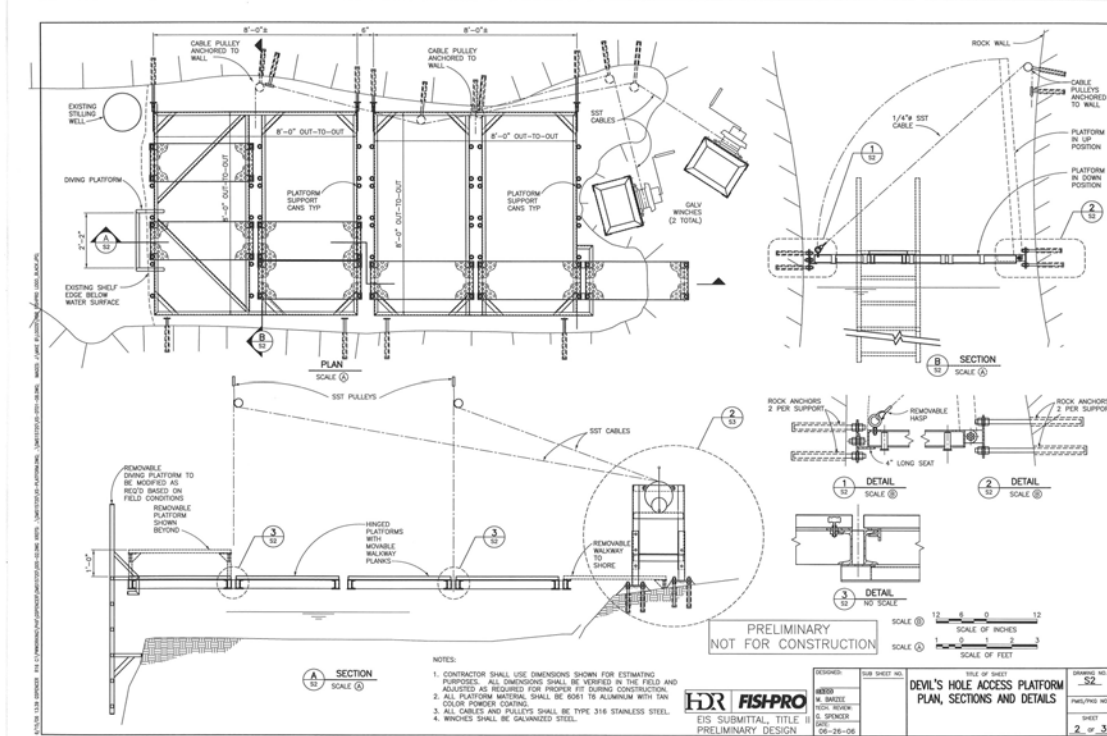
Hinged monitoring platform, bolted to the east wall—Alternative B
